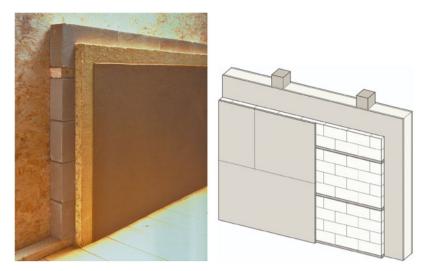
Wood panel construction with integrated earth block layer [52]
